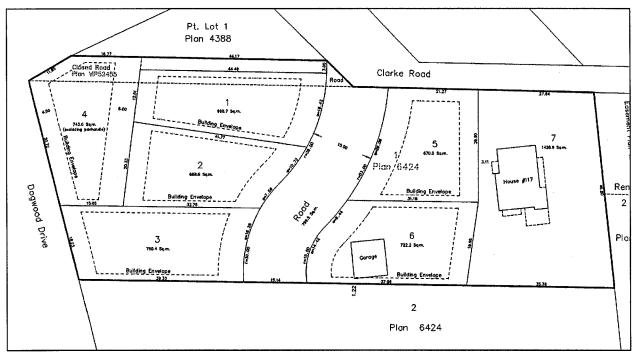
Clarke Road Proposed Subdivision Plan (PLA)
